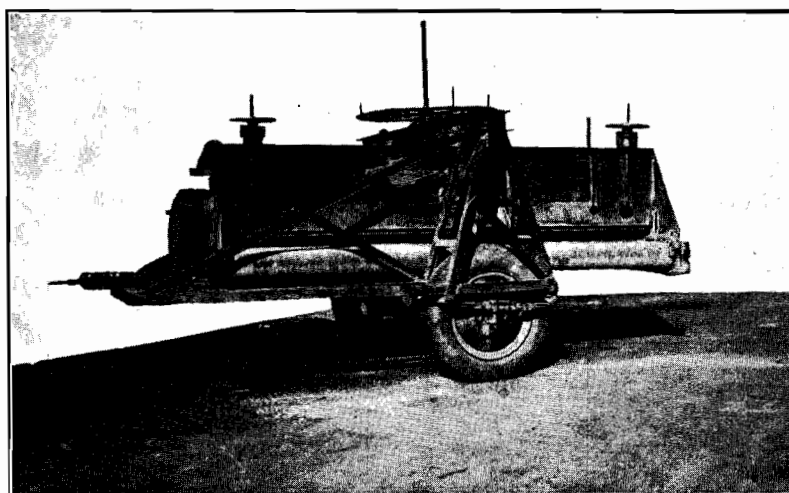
Rotating Belt Aggregate Spreader Mounted on Carrier.
